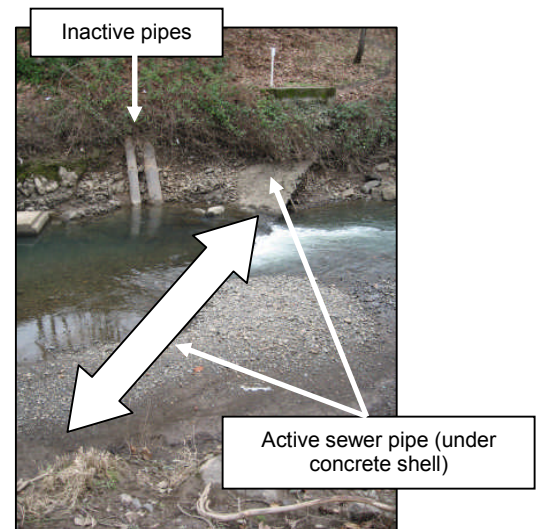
City of Milwaukie sewer pipe crossing Johnson Creek
